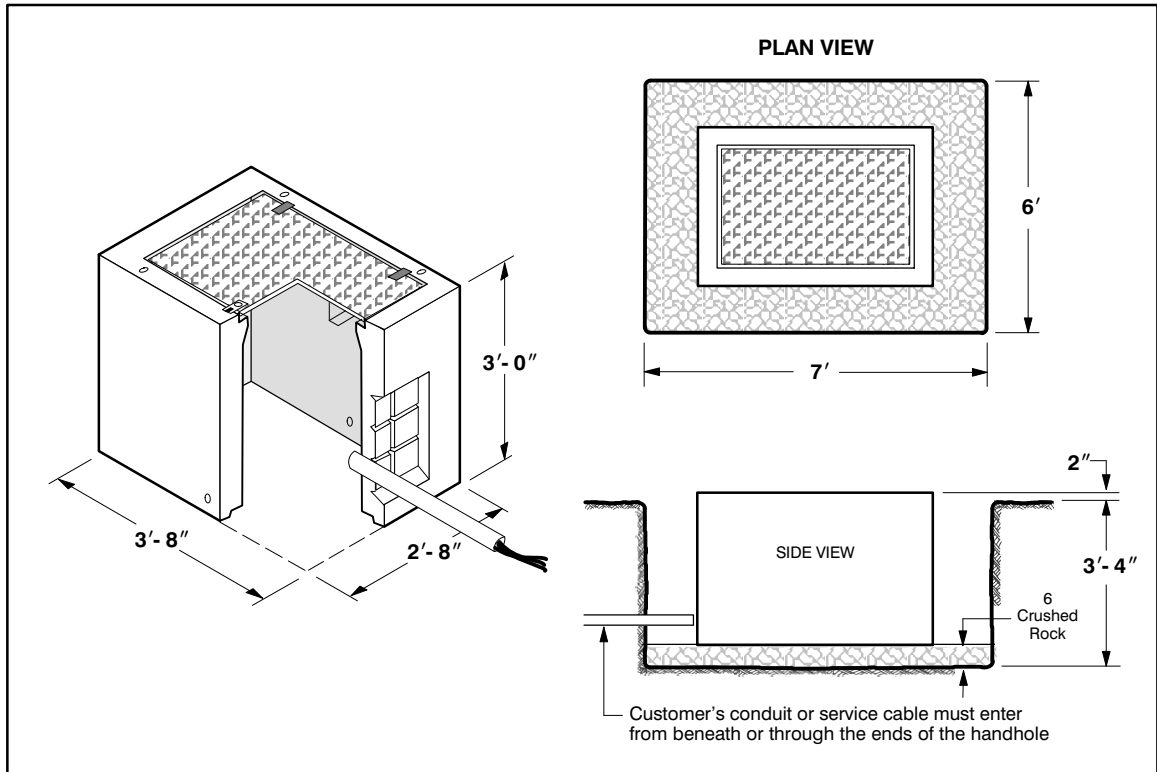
Minimum dimensions and excavation requirements for a small, secondary connection handhole
